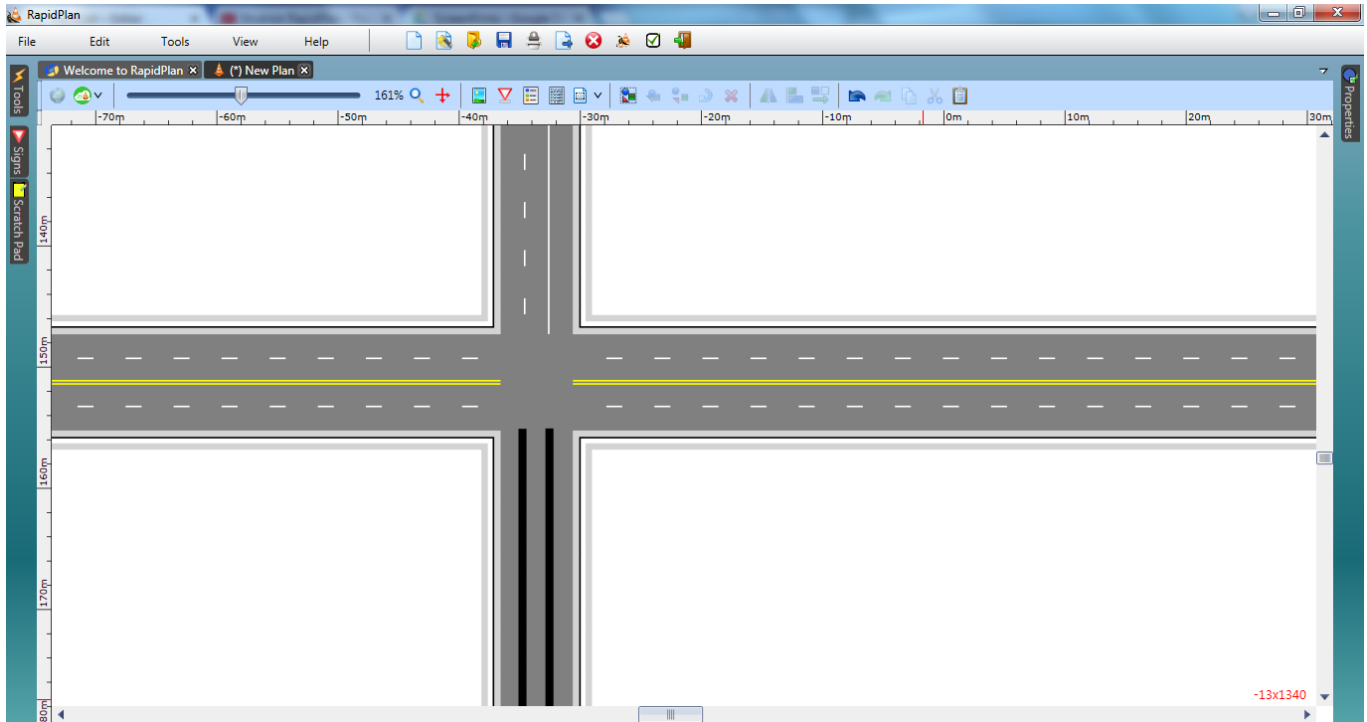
Crossroad Intersection steps 3 4 5 and 6
